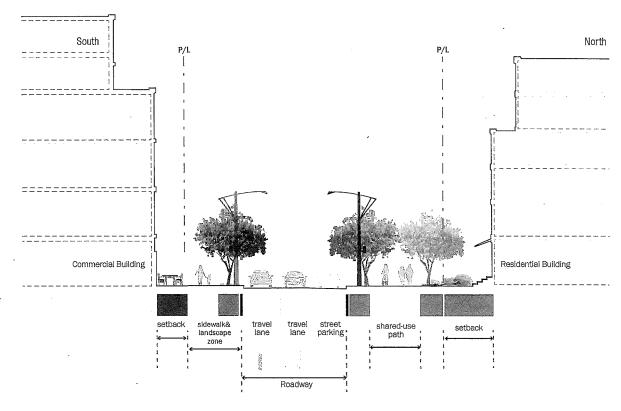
Recommended Cross Section within Approved 104 Avenue Right-of-Way
